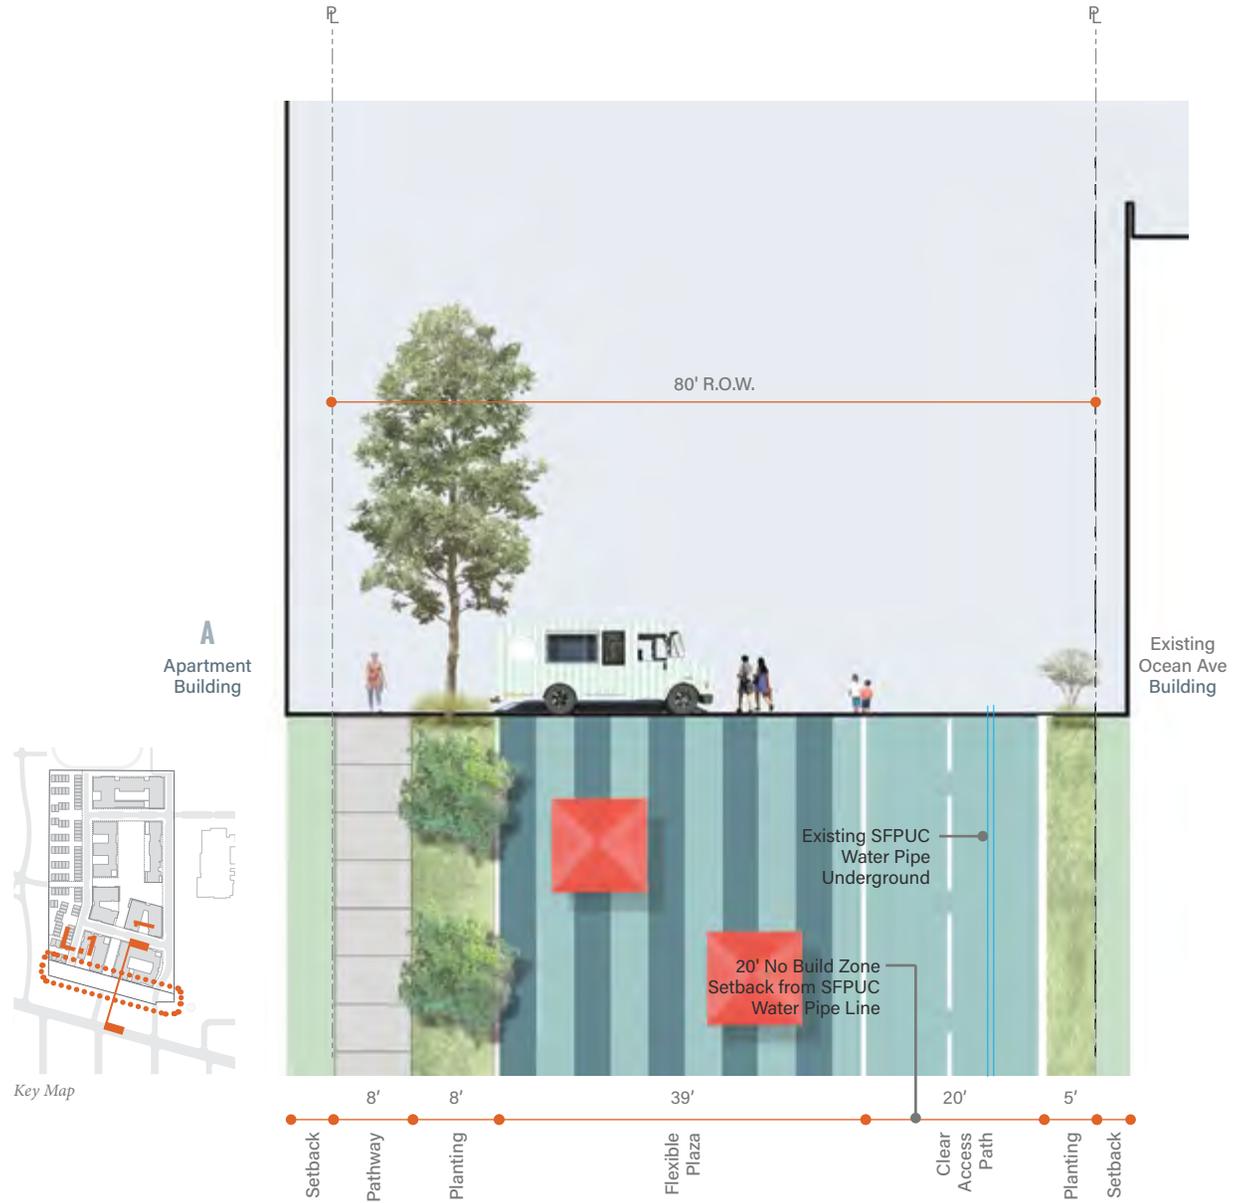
SFPUC Retained Fee Open Space Section
